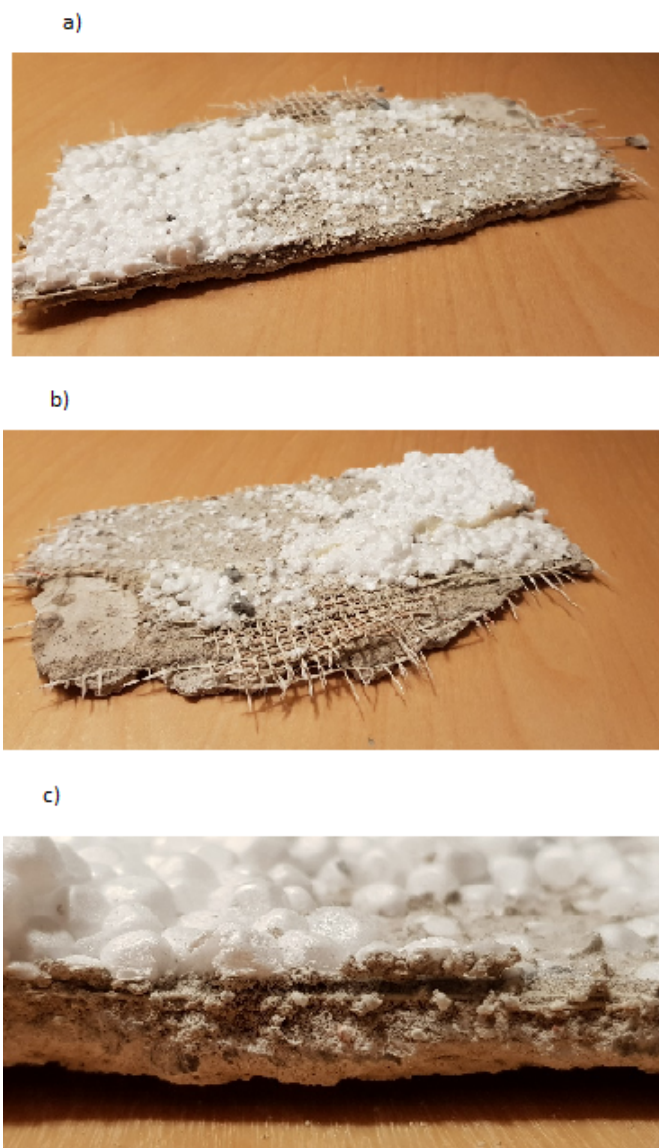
Details of thermal insulation (substrate) a), b) and c) for the ceramic cladding of the building facade
